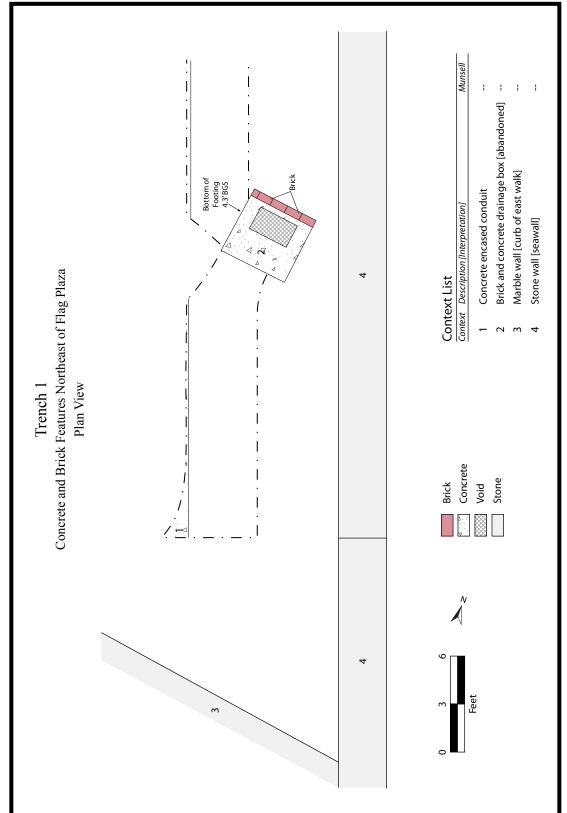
Trench 1: Plan of Concrete and Brick Features Northeast of Flag Plaza.
